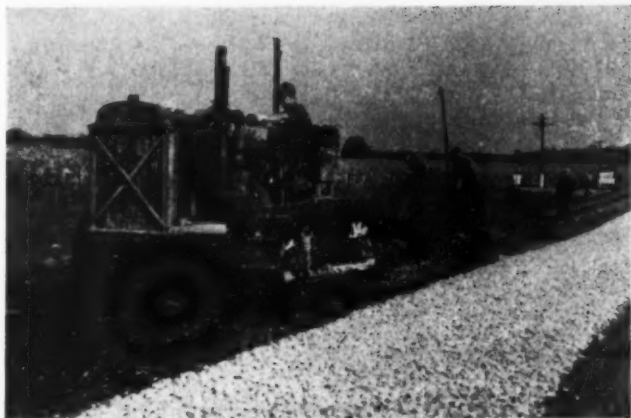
Crawler Tractor and Multi-Blade Mixing Spreader Making Roadmix Binder Course to Level an Old Second Class Bituminous Concrete Hot Mix Top to Convert It Into a Heavy Duty Road
